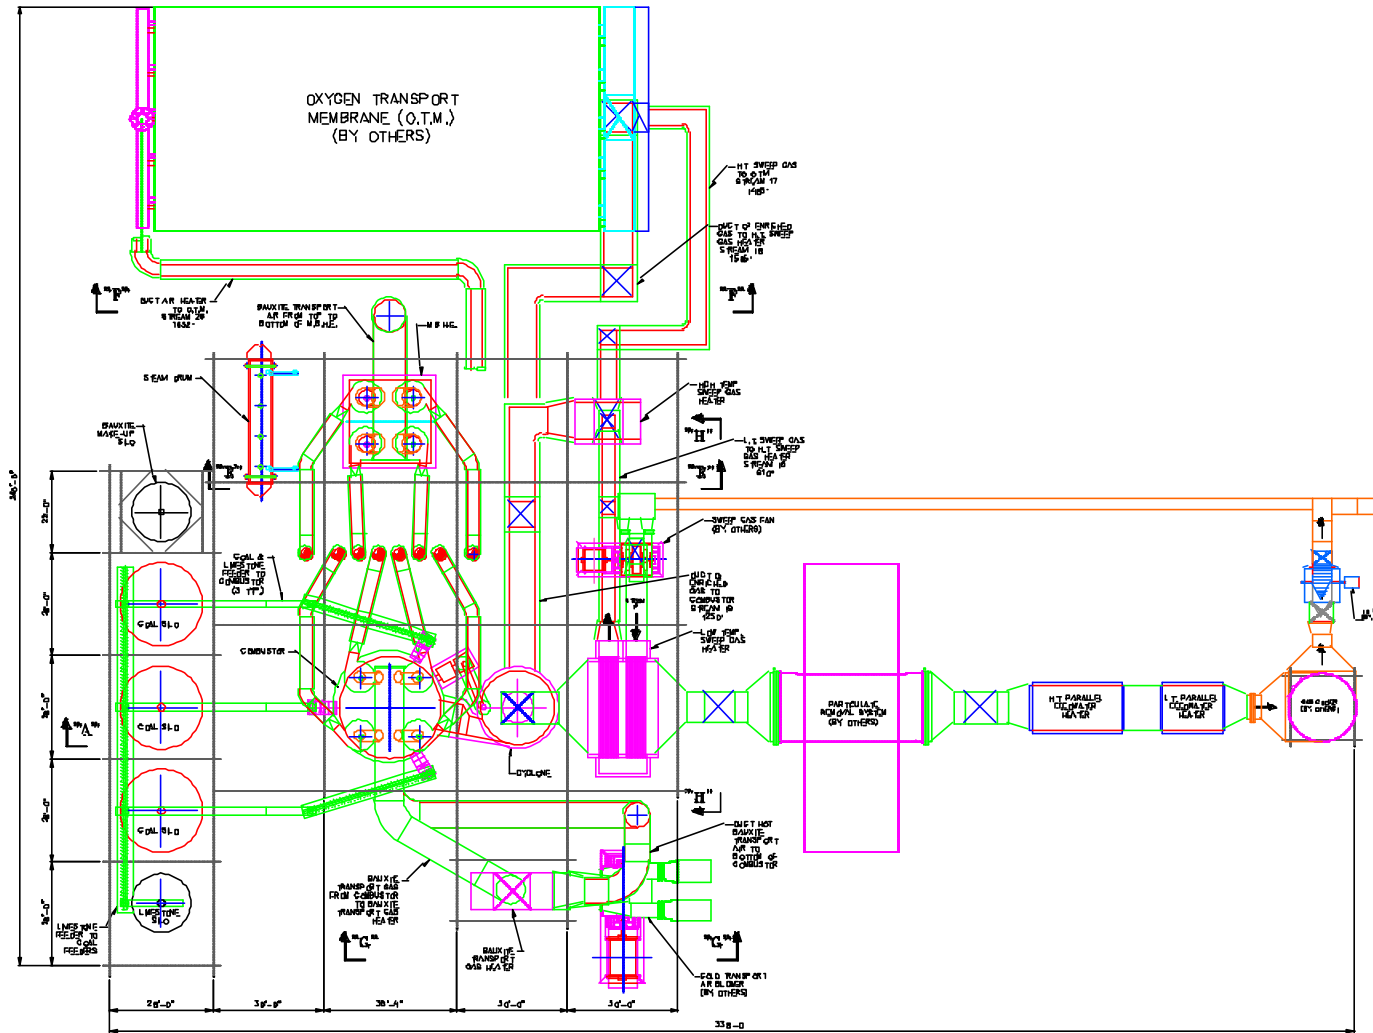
Case-6 Boiler Island General Arrangement Drawing – Plan View
